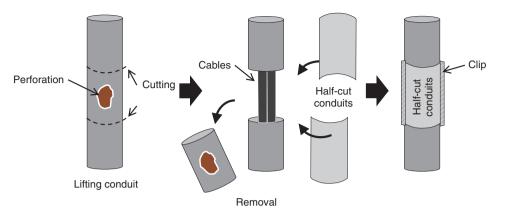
Repair of lifting conduit with half-cut-conduit method.
